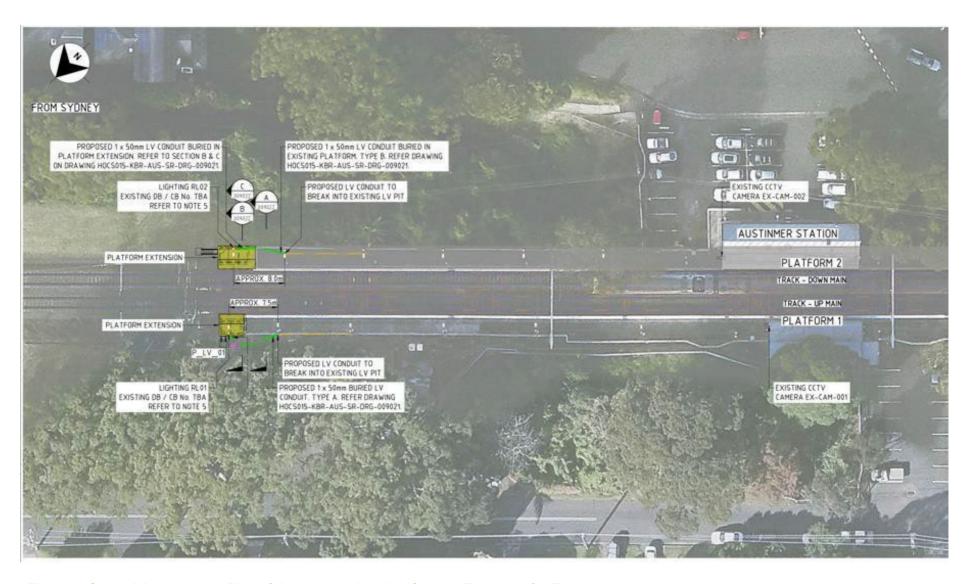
General Arrangement Plan of the proposed works (Source: Transport for Tomorrow, 2025)
